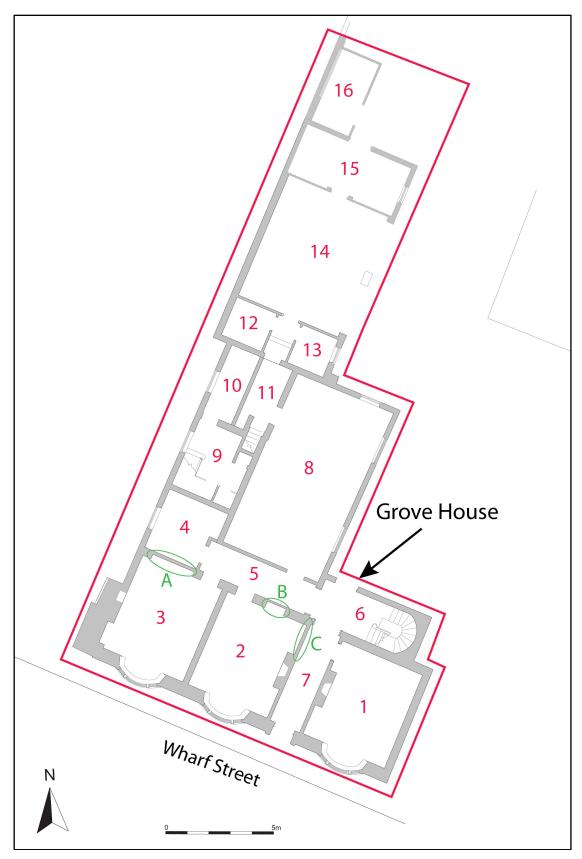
Ground floor layout of Grove House (areas of watching brief - A-C)
